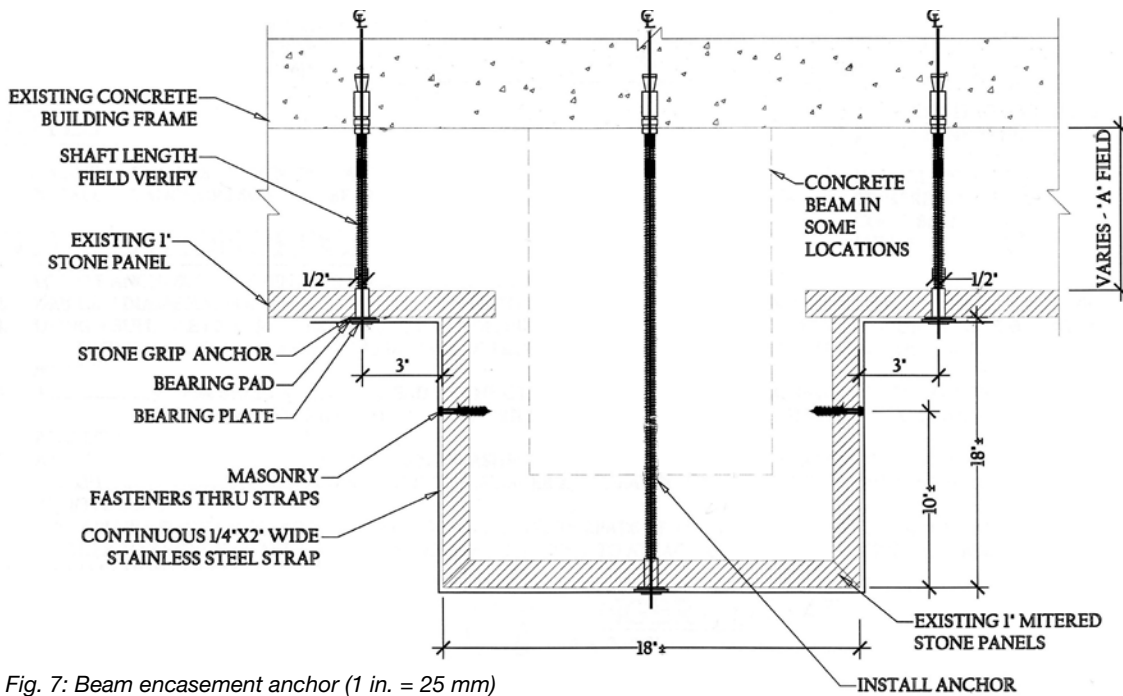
Beam encasement anchor (1 in. = 25 mm)
